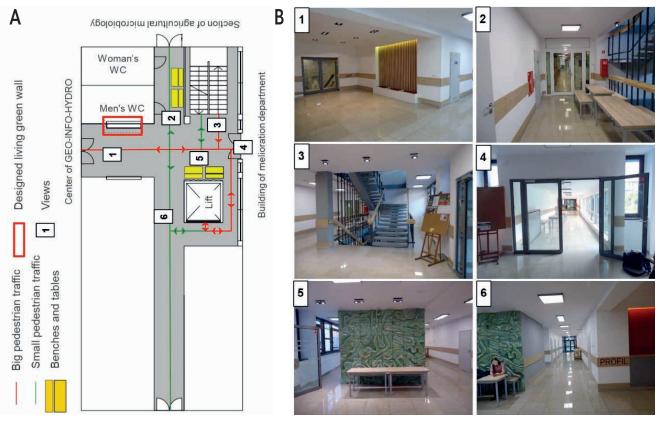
Floor plan (A) and views (B) of the public interior for which the concept design was created (Source: Madej 2018, modified by B. Jawecki) Ryc. 1. Schemat (A) i widoki (B) wnętrza publicznego będącego przedmiotem koncepcji (Źródło: Madej 2018, modyfikacja B. Jawecki)
